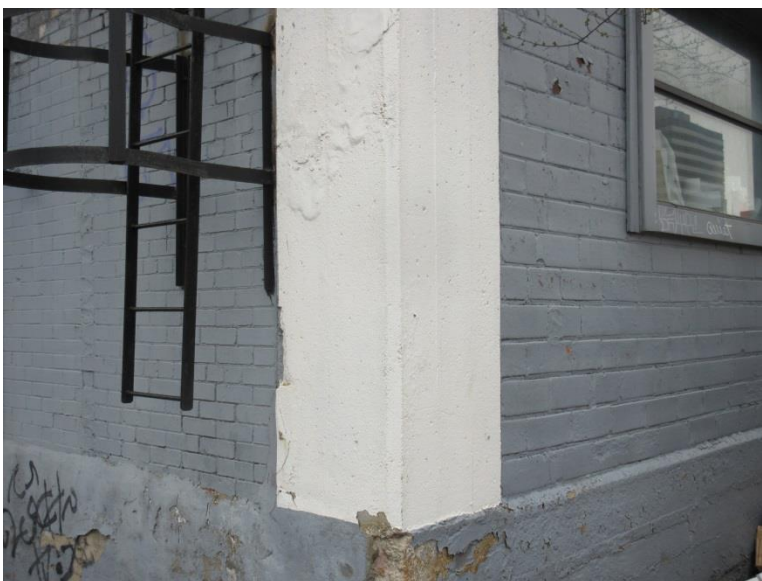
Detail of the southeast corner of the building at 304 Talbot Street. Note the brick masonry to the right and the applied clay tiles to the left of the concrete structural member (April 30, 2015).
